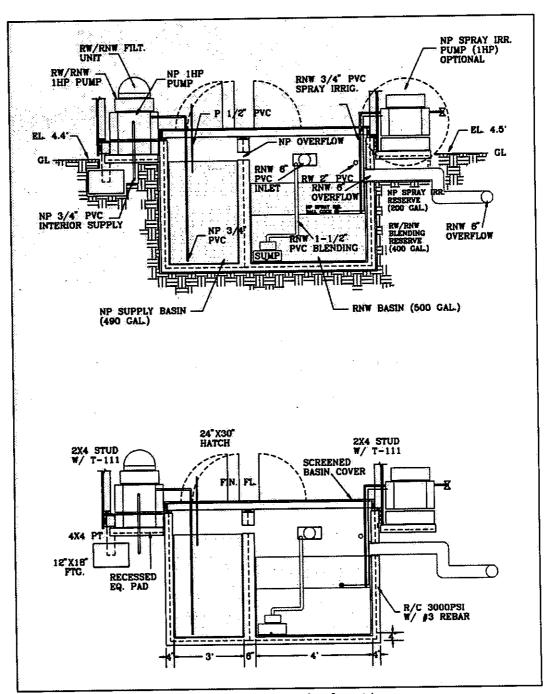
Greywater facility north elevation. Grosskopf, Kevin R. University of Florida, 1994.
